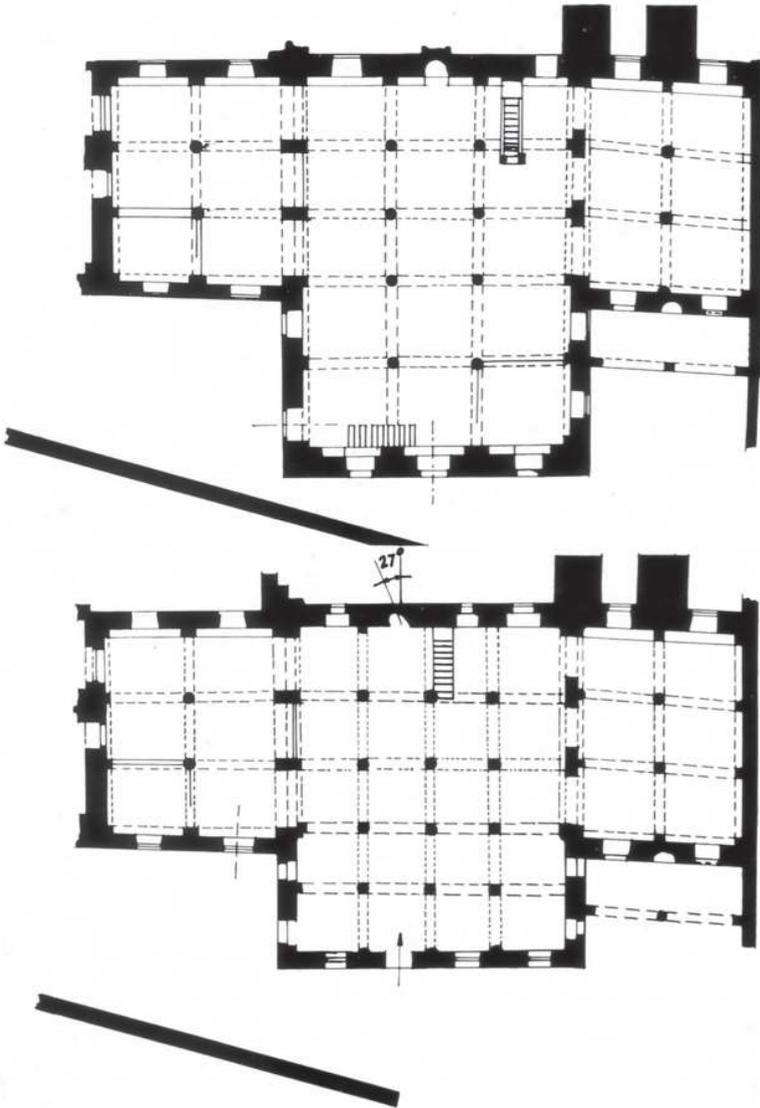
Jāmi' of Sīdī Darghūt Pasha, floor plan, first phase and after reconstruction.
